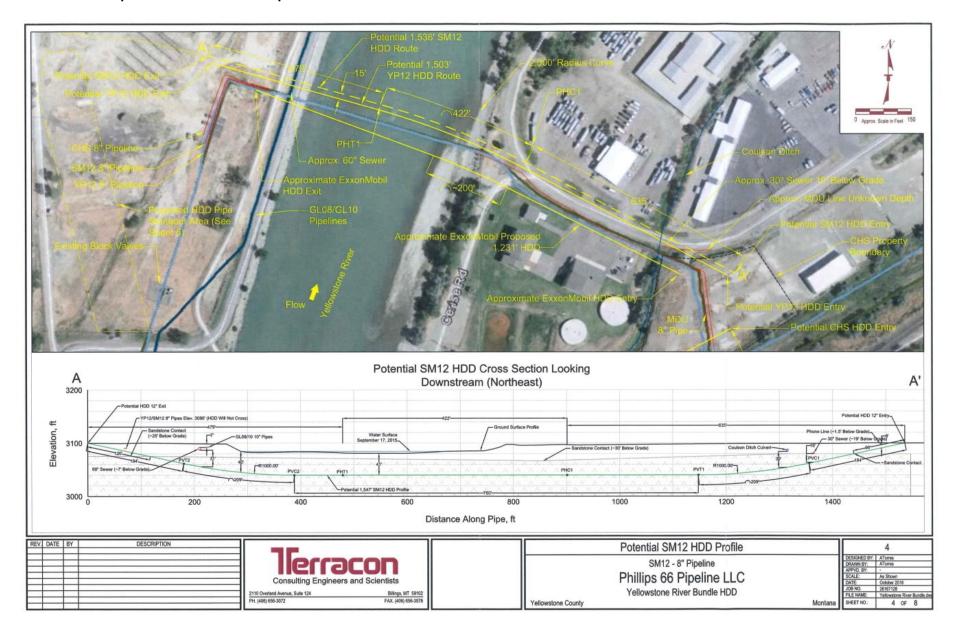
Exhibit C - Yellowstone Pipe Line Pipeline Plan and Profile
